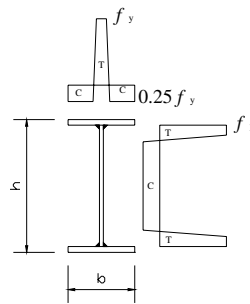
Residual stresses in an IPE welded section: C – compression; T – tension.
